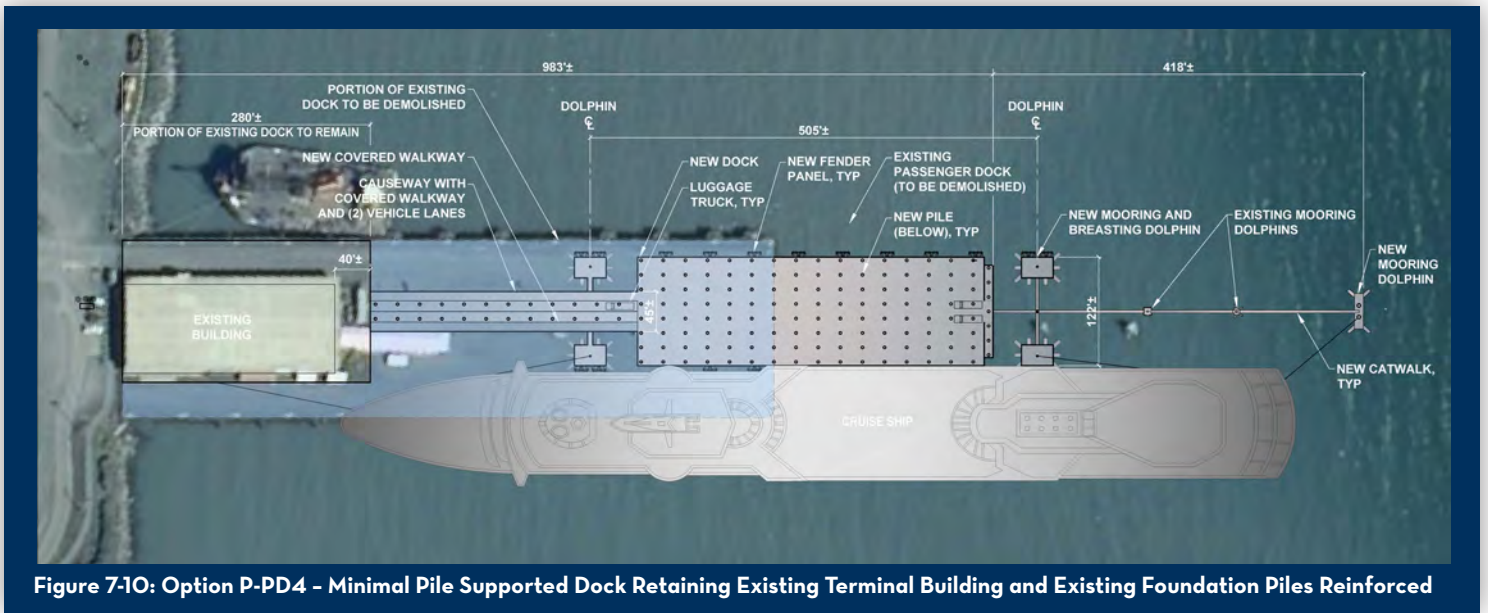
Option P-PD4 - Minimal Pile Supported Dock Retaining Existing Terminal Building and Existing Foundation Piles Reinforced
